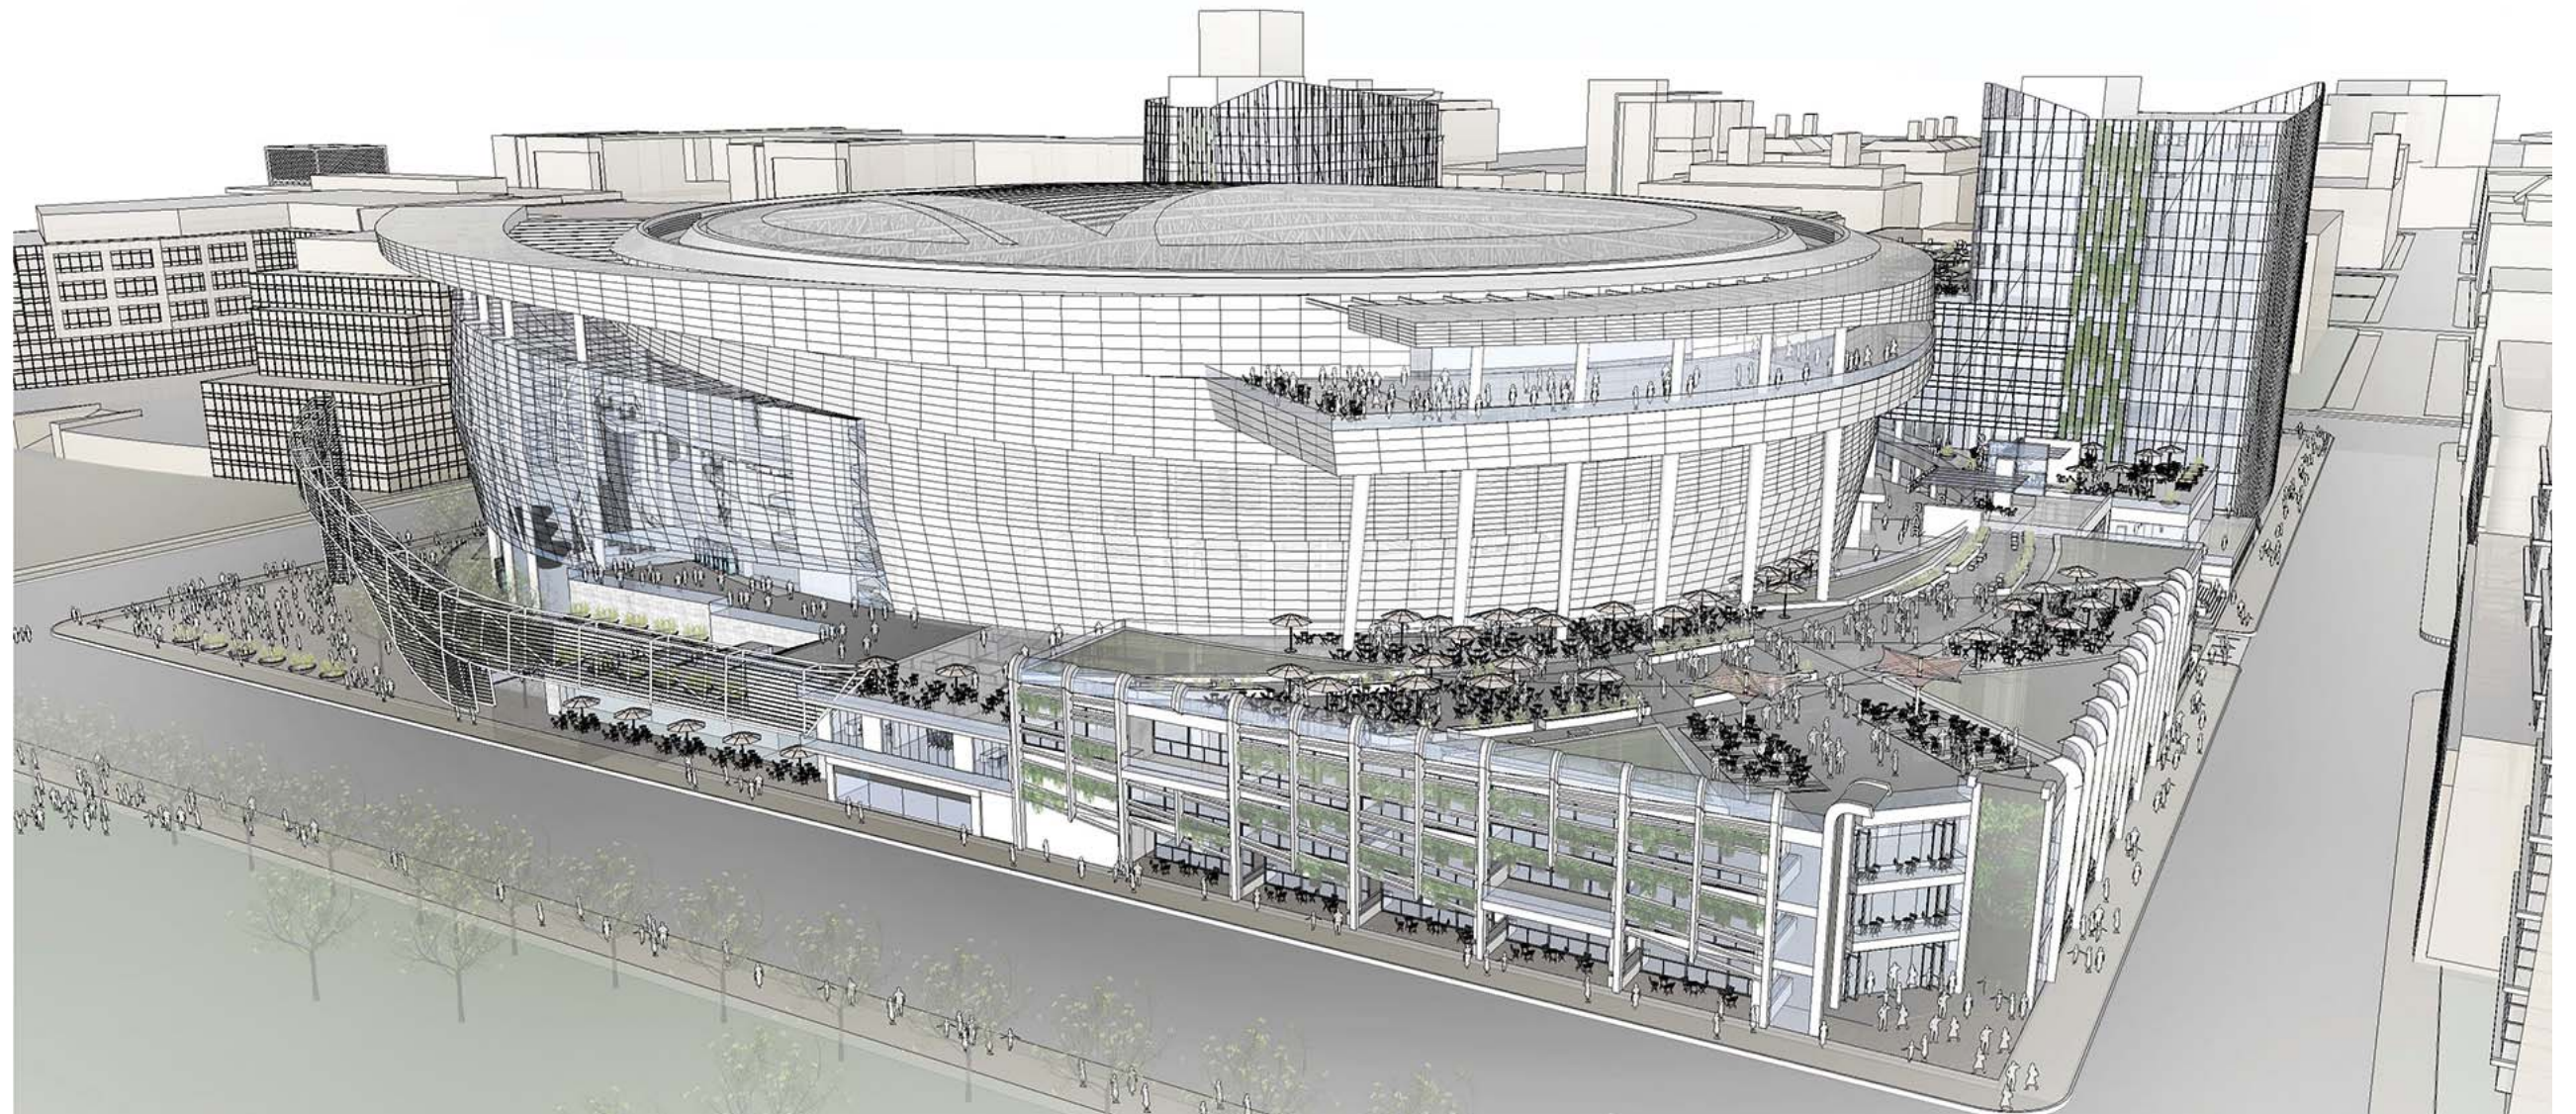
Concept Sketch Northeast Corner - Food Hall and Bayfront Terrace
